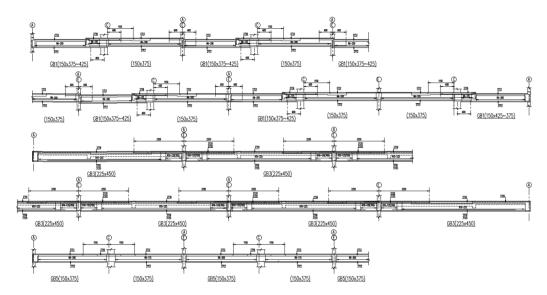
Image shows the reinforcement bars needed for GB1, GB3 & GB5.
